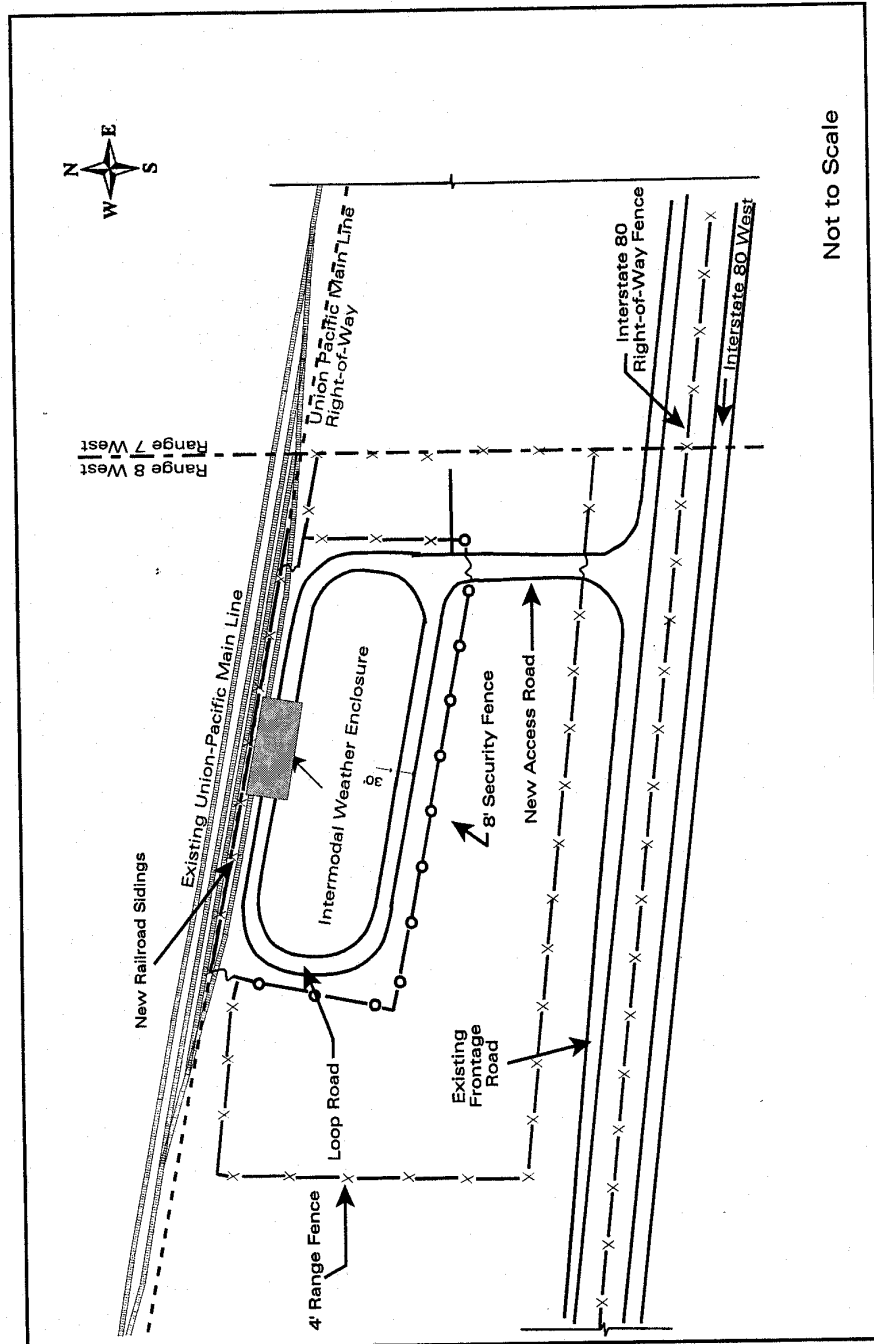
Basic site plan and layout for the Intermodal Transfer Facility.
